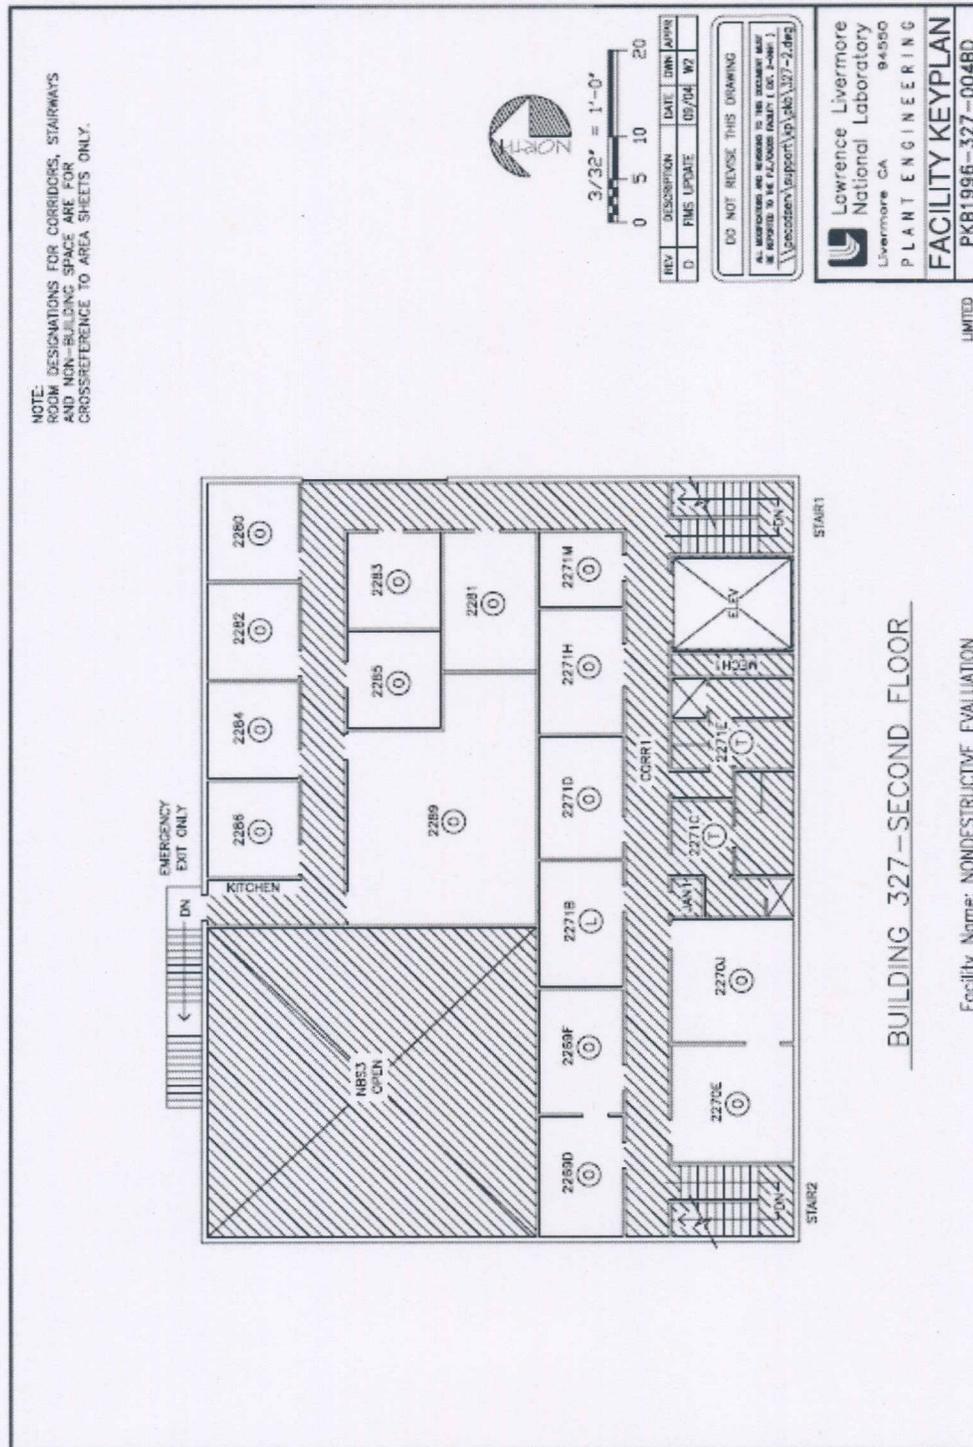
Floor Plan of the Second Floor and Mezzanine of B327
